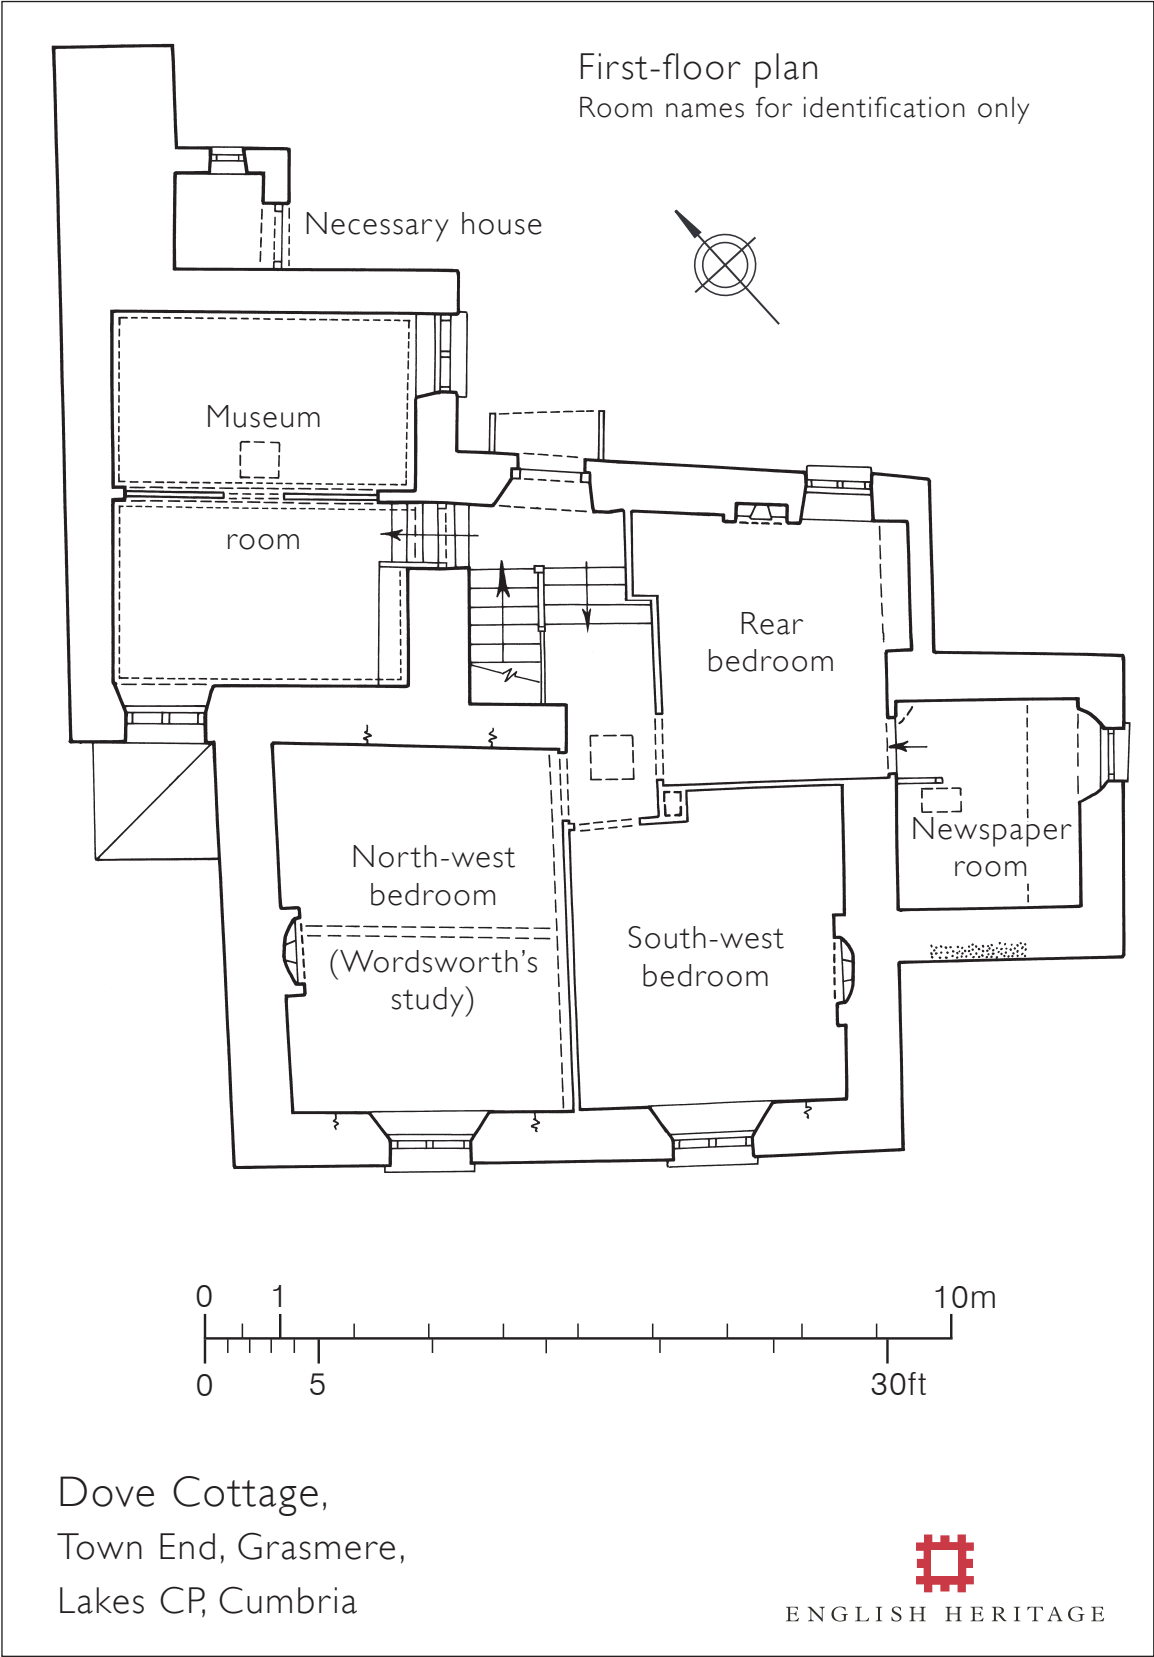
First-floor plan of Dove Cottage. © English Heritage
